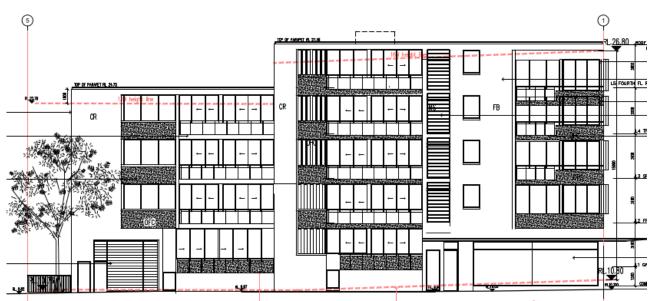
View of the north-east elevation (Underwood Road) of the proposed development illustrating the extent of the building height variations.
